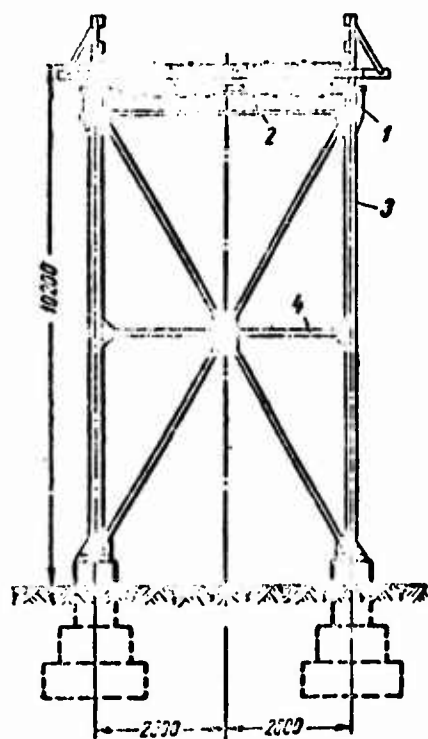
The trestle of a combined design: 1 - main beam; 2 - transverse beams; 3 - upright; 4 - connections.
